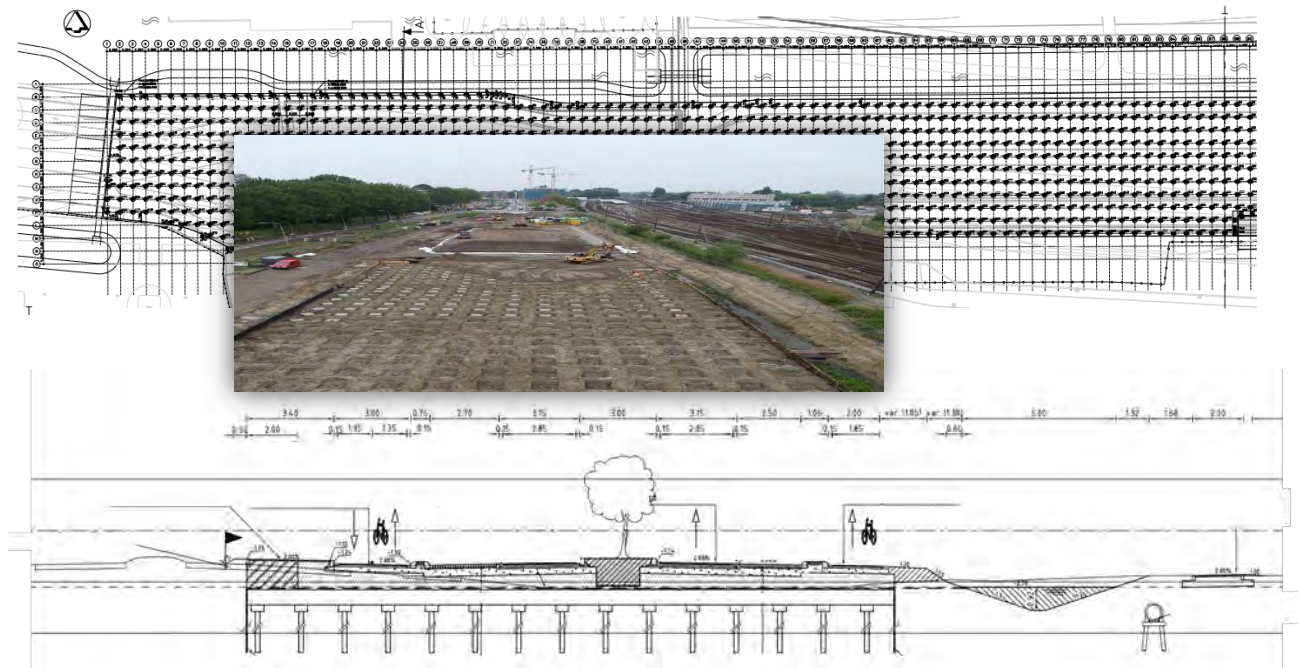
Gouda very slender LTP, pile grid and construction (upper) and cross section (lower)
